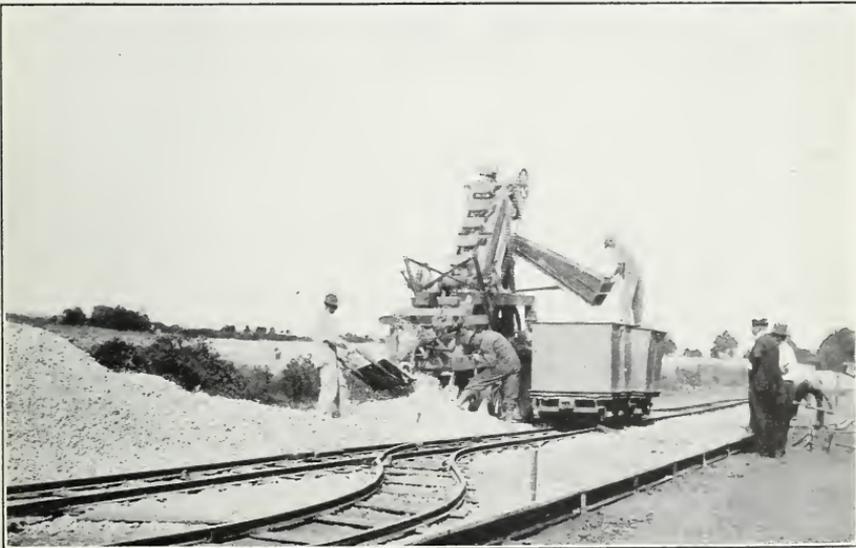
LOADING BATCH BOXES FROM SMALL STOCK PILES ON THE SIDE OF THE ROAD WITH A BUCKET ELEVATOR.
